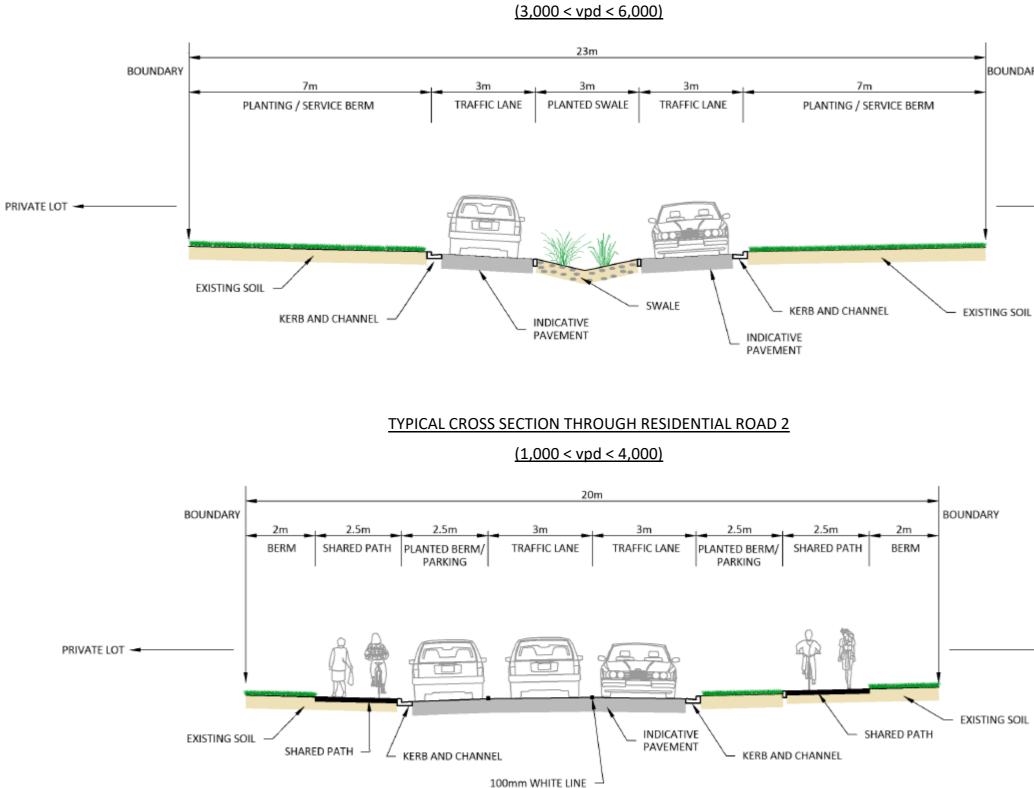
Ohinewai Structure Plan - Road cross sections – Local Roads (Residential Roads)
